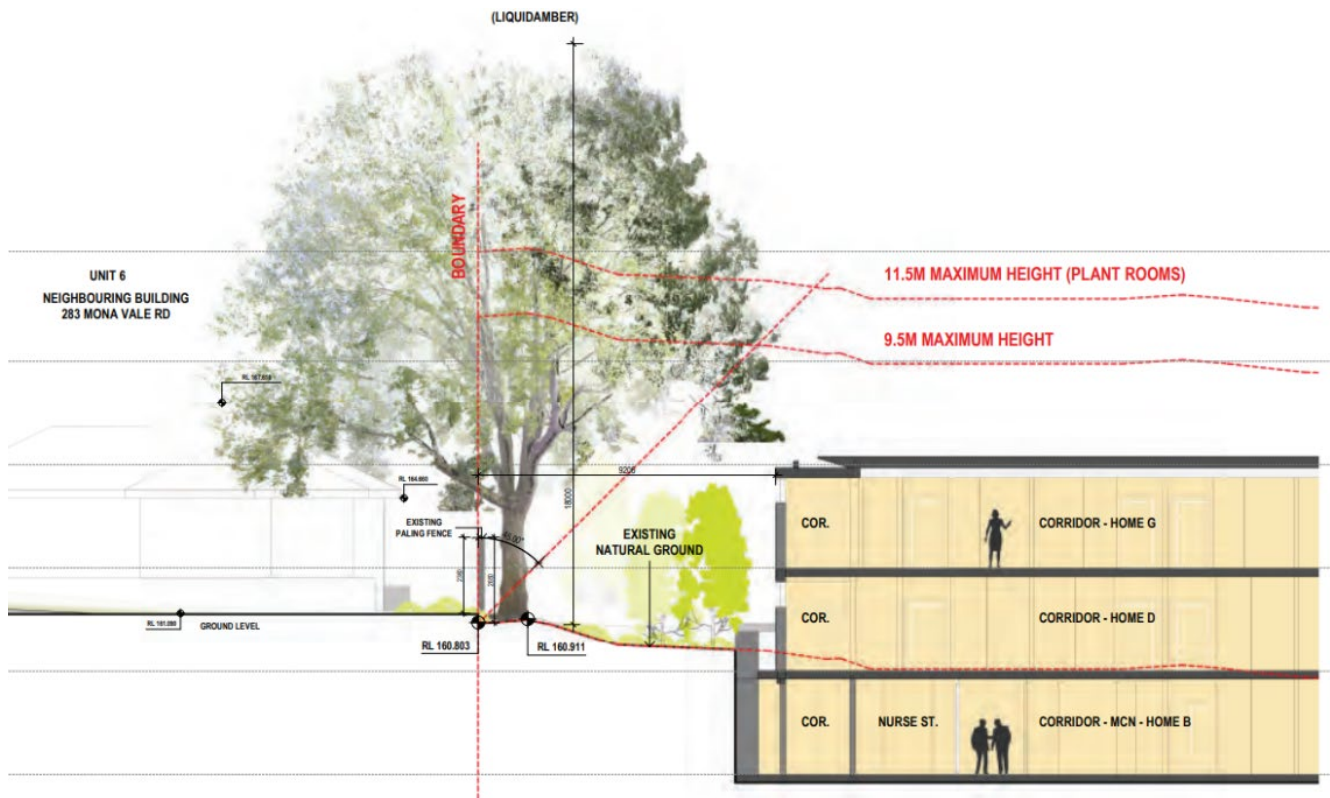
| Interface between subject site and townhouse development at 283 Mona Vale Road (Source: Applicant's amended design response)
